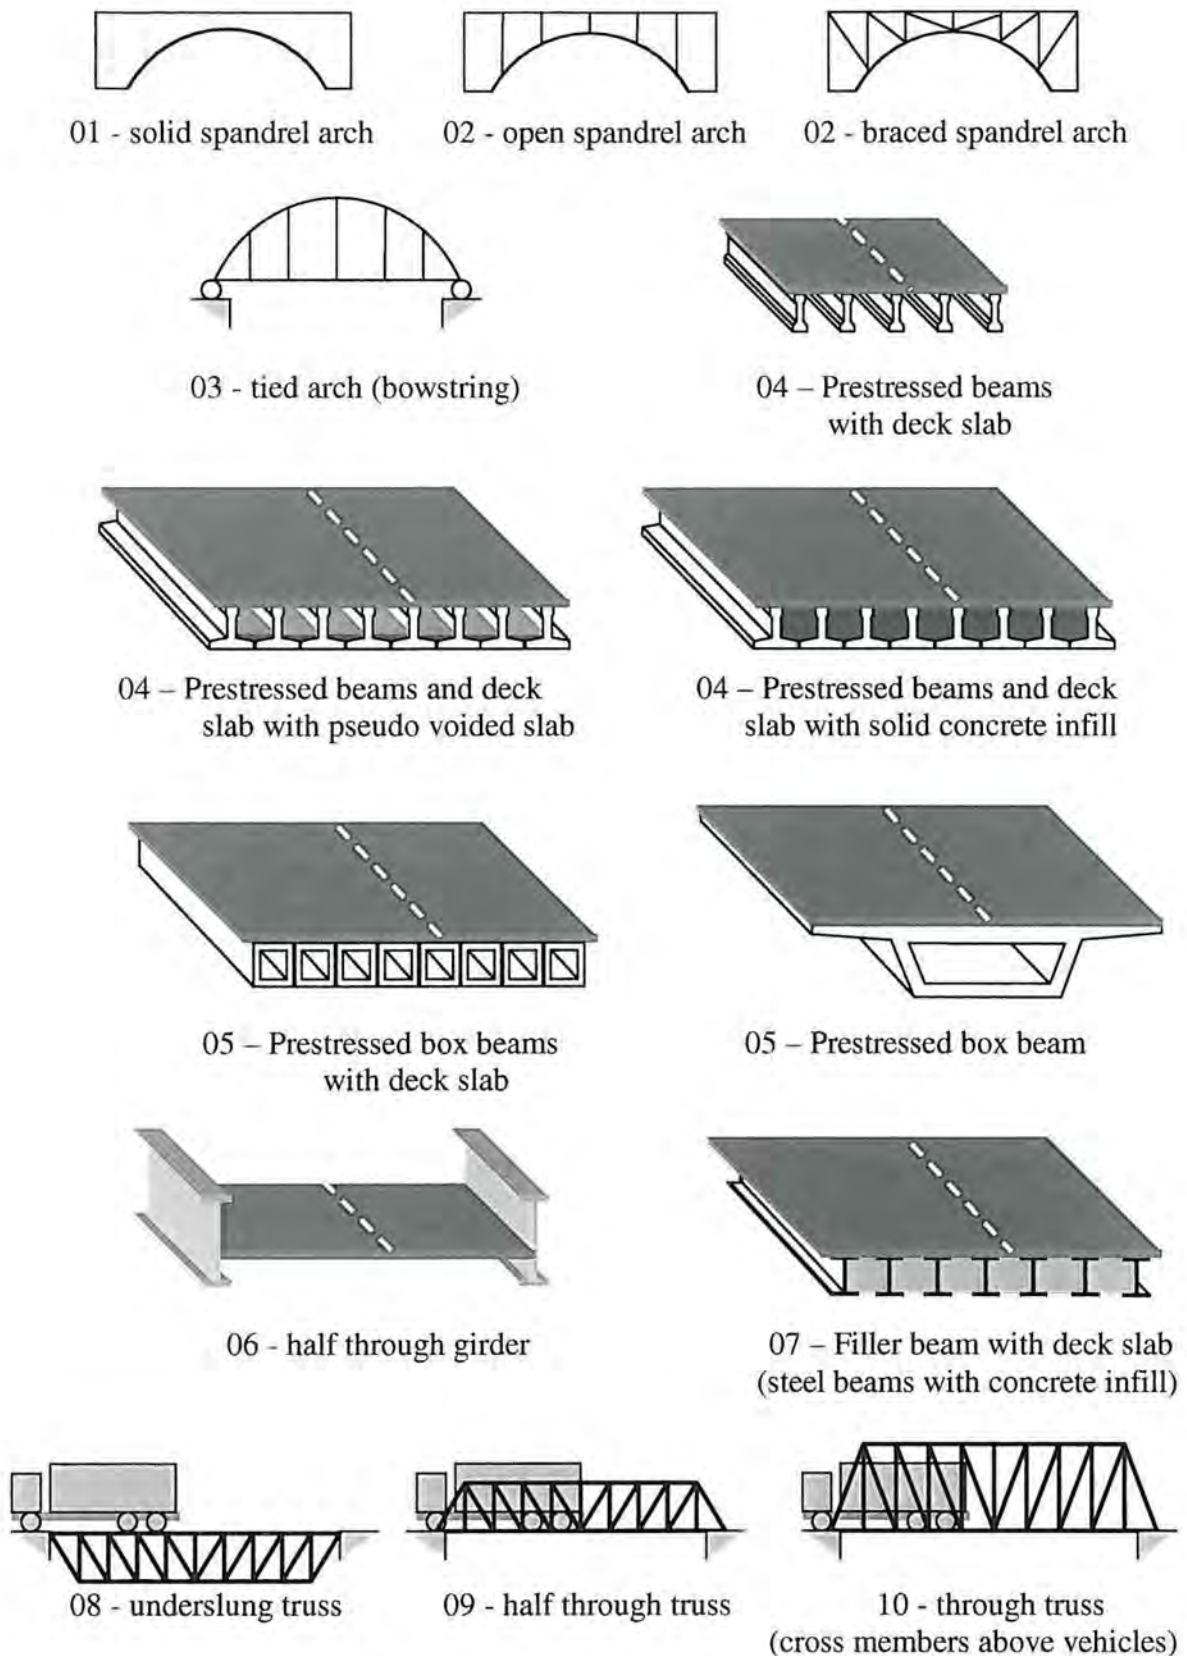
Schematic of Bridge Types and Primary Deck Elements
